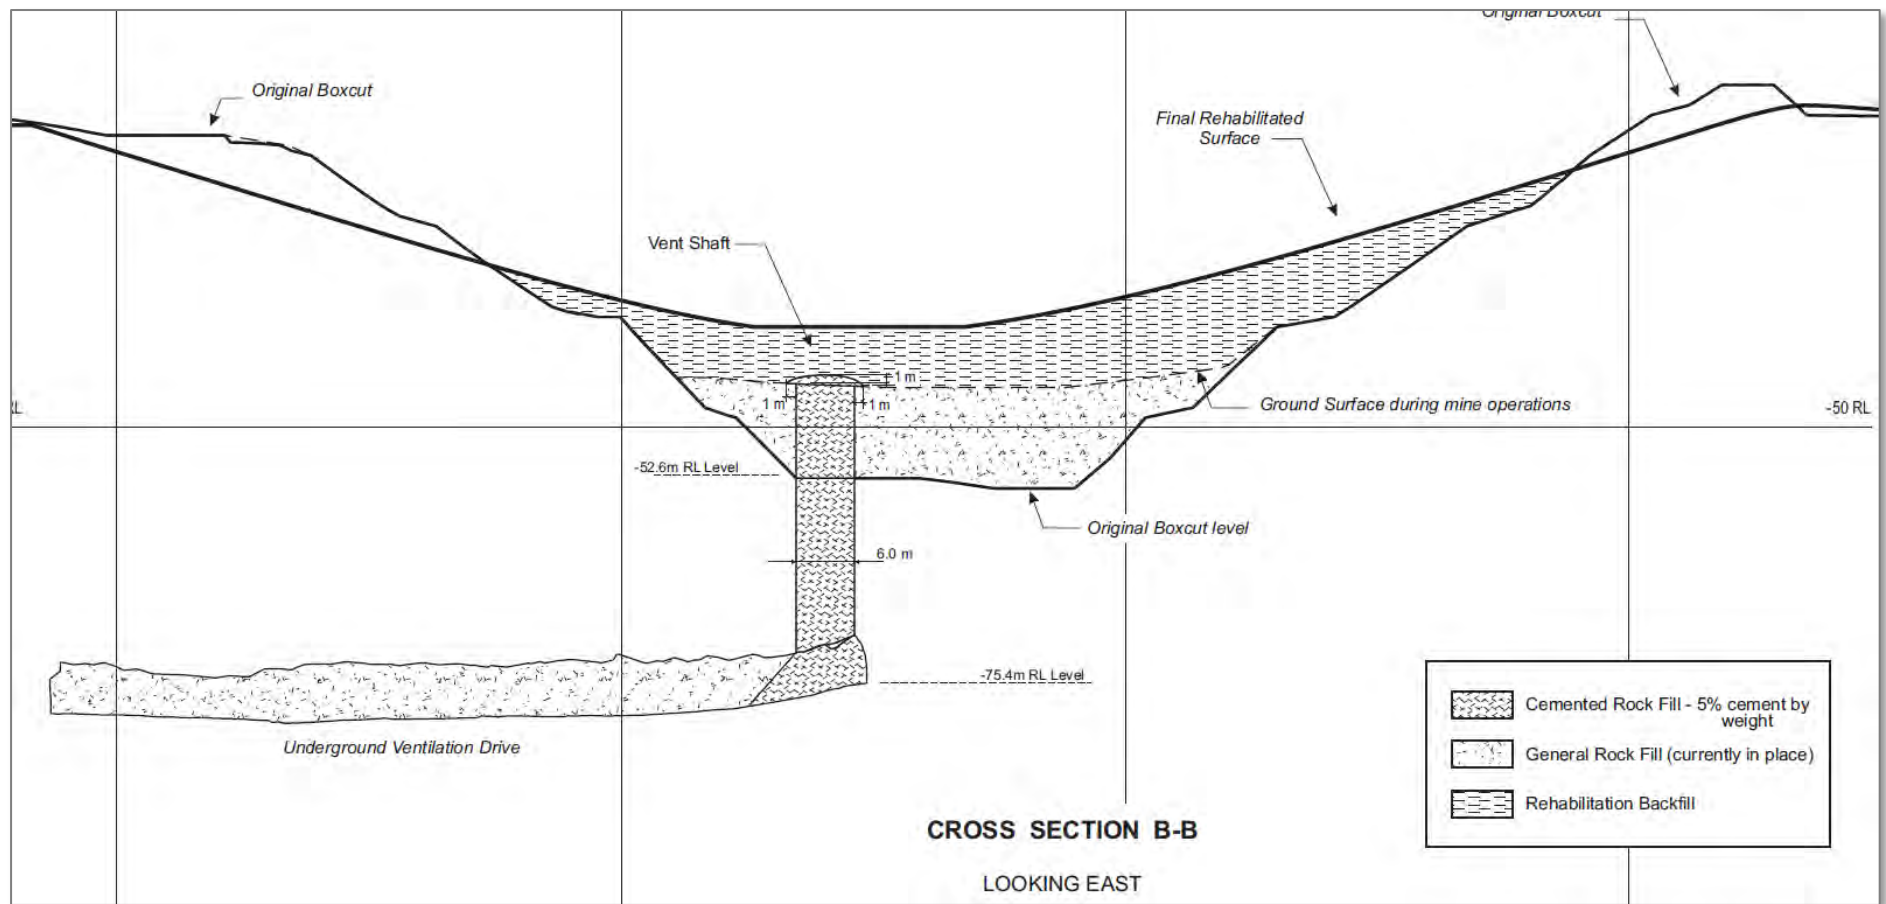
| A SIMILAR SYSTEM TO THAT APPROVED AS PART OF THE CLOSURE PLAN STRATEGY FOR THE ANGAS ZINC MINE FOR BACKFILLING OF THE VENTILATION RAISE WILL BE USED AT BIH FOR THE RAISES AT THAT SITE (TERRAMIN AUSTRALIA, 2017)
